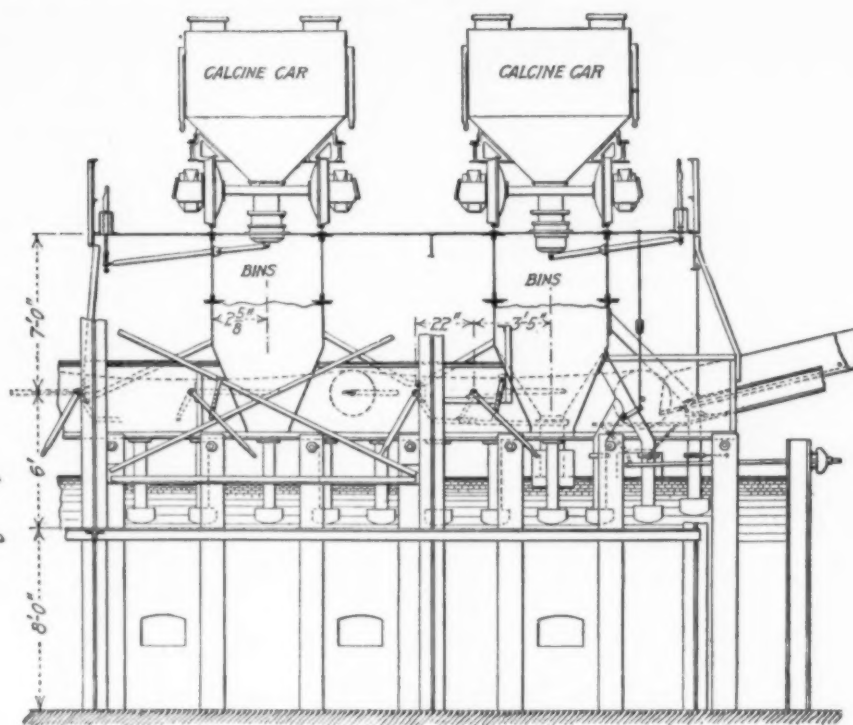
LONGITUDINAL SECTION REVERBERATORY FURNACE SHOWING CHARGING ARRANGEMENT
